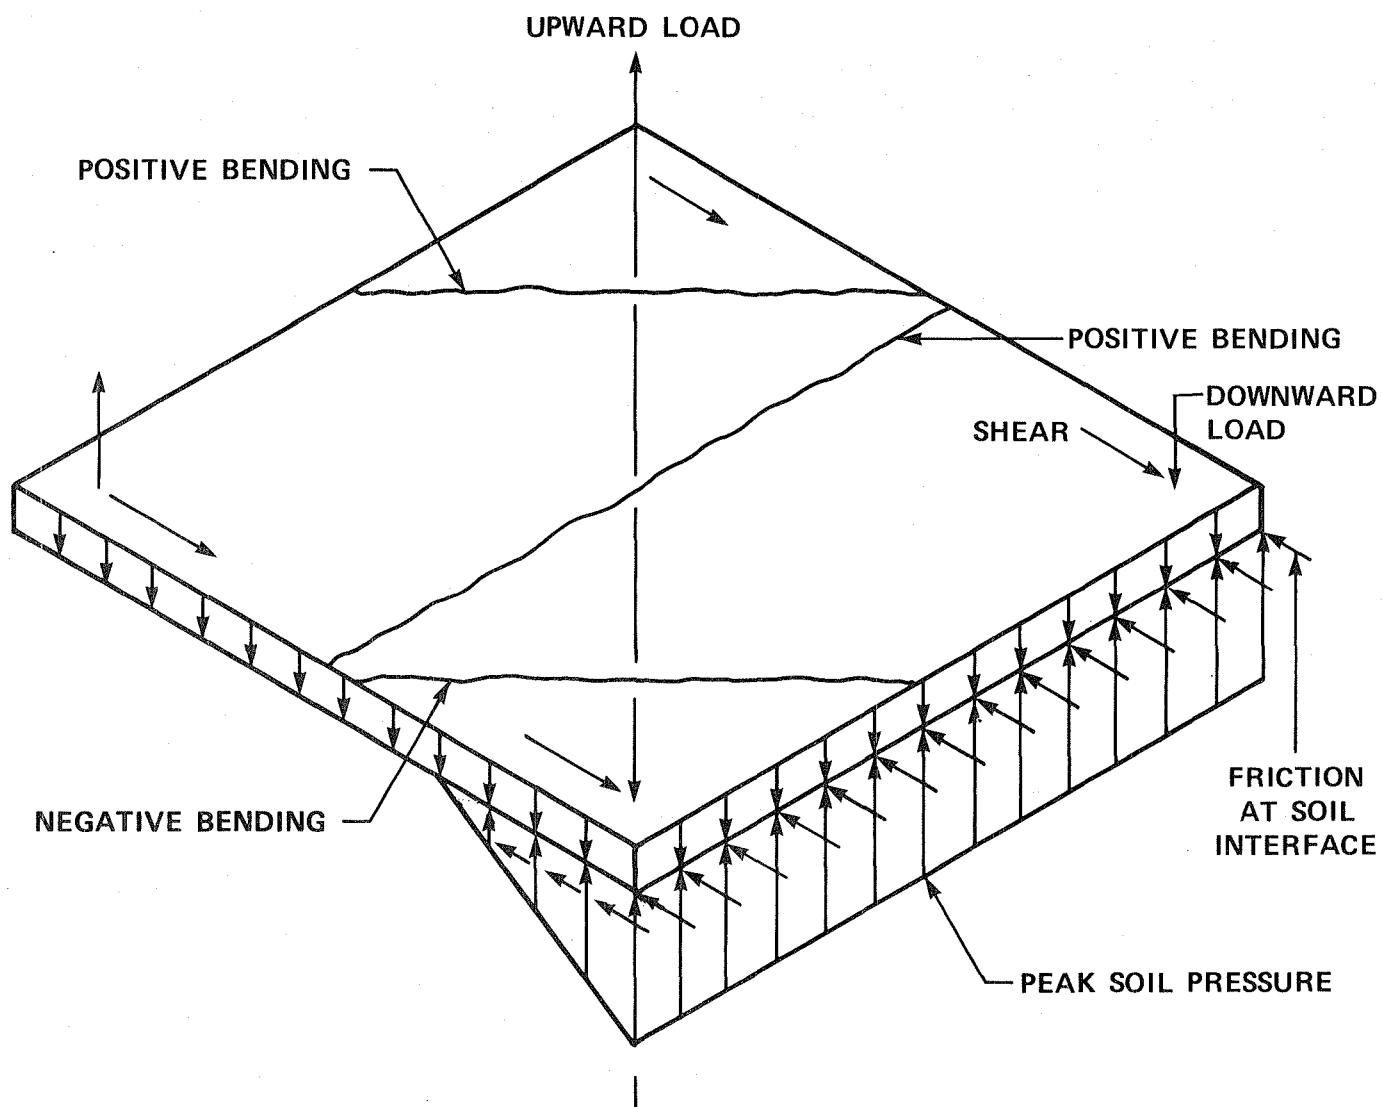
Wind Turbine Tower Foundation Load Schematic
